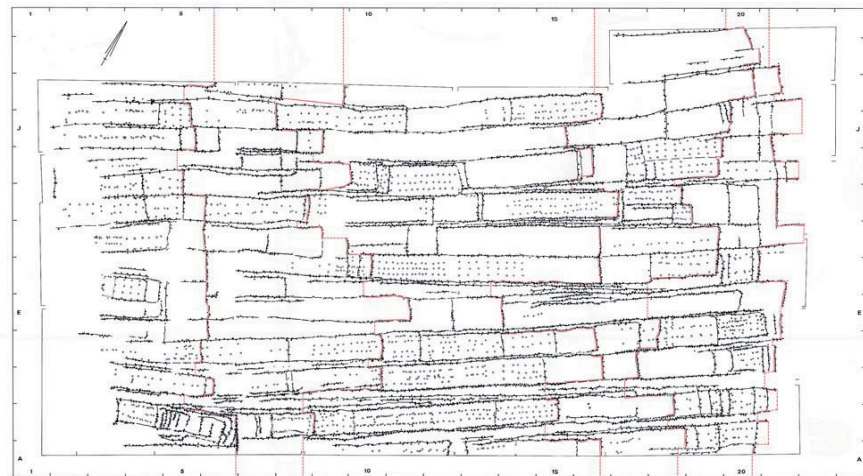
Top view of wooden planking of a slipway in Dorestad (near Utrecht) the Netherlands 900 [Van Es 1994]
